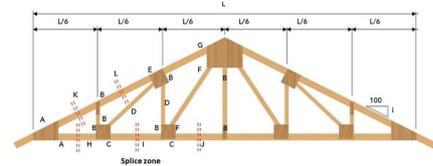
Example of typical roof framing in timber houses (Fritz, 2007).
